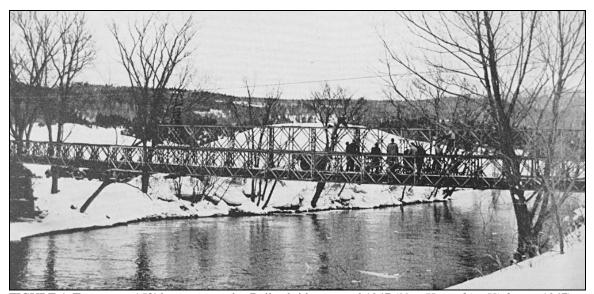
Temporary 150'-long war surplus Bailey bridge erected 1947 (New Hampshire Highways 1947).
